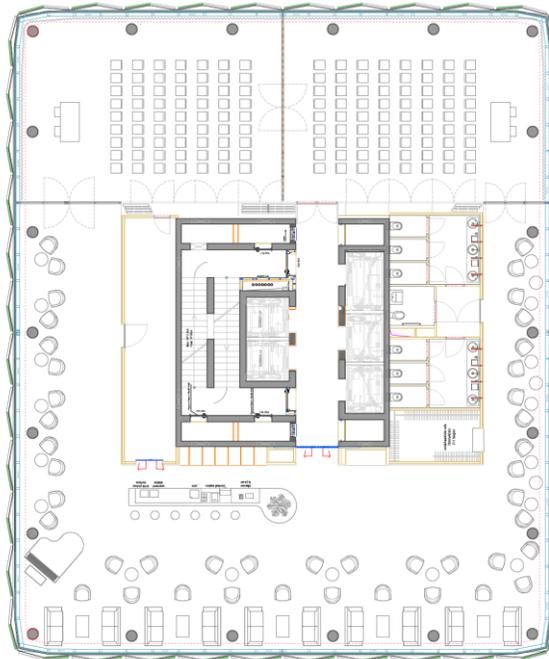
Floor 23 Layout (Conference room and Piano Bar)
